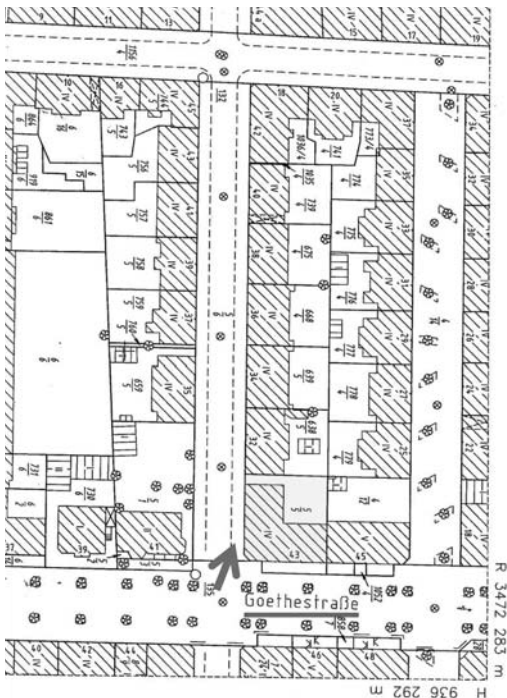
Site plan with arrow pointing to the Goethestrasse apartment building, at one corner of a dense urban housing block. (Source: Ståwog)
